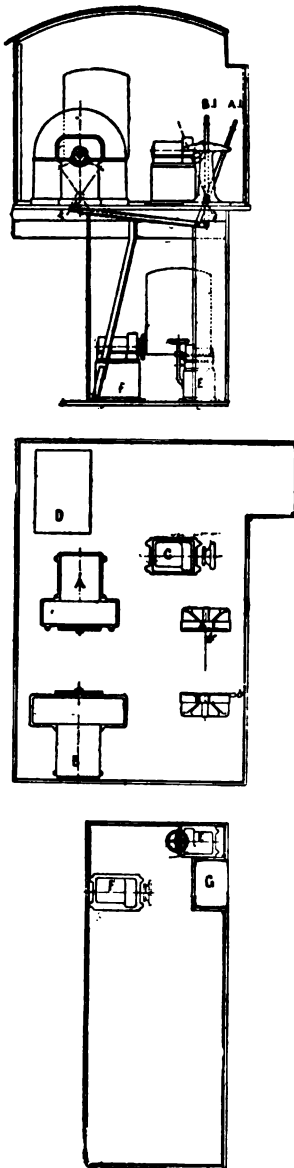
Plan of Top and Bottom Floor, also Section through Cabin.
